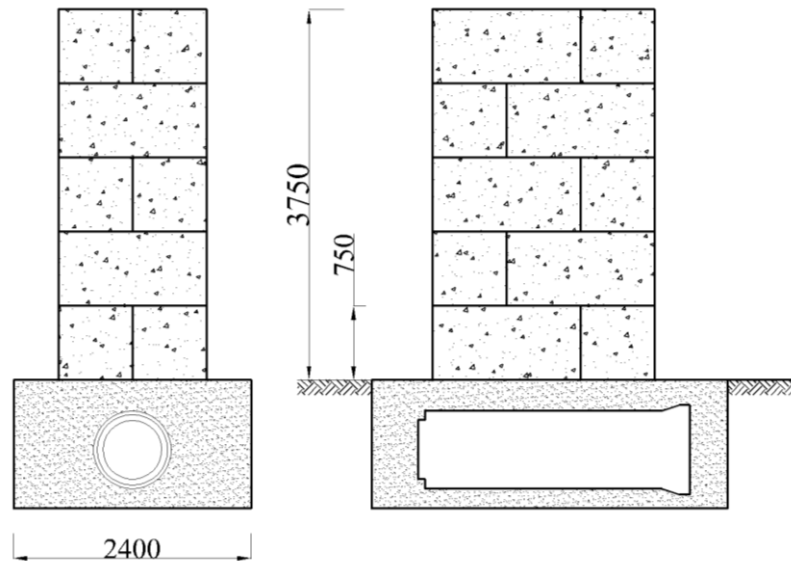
Schematic of loading using concrete blocks in the second experimental campaign (mm).
